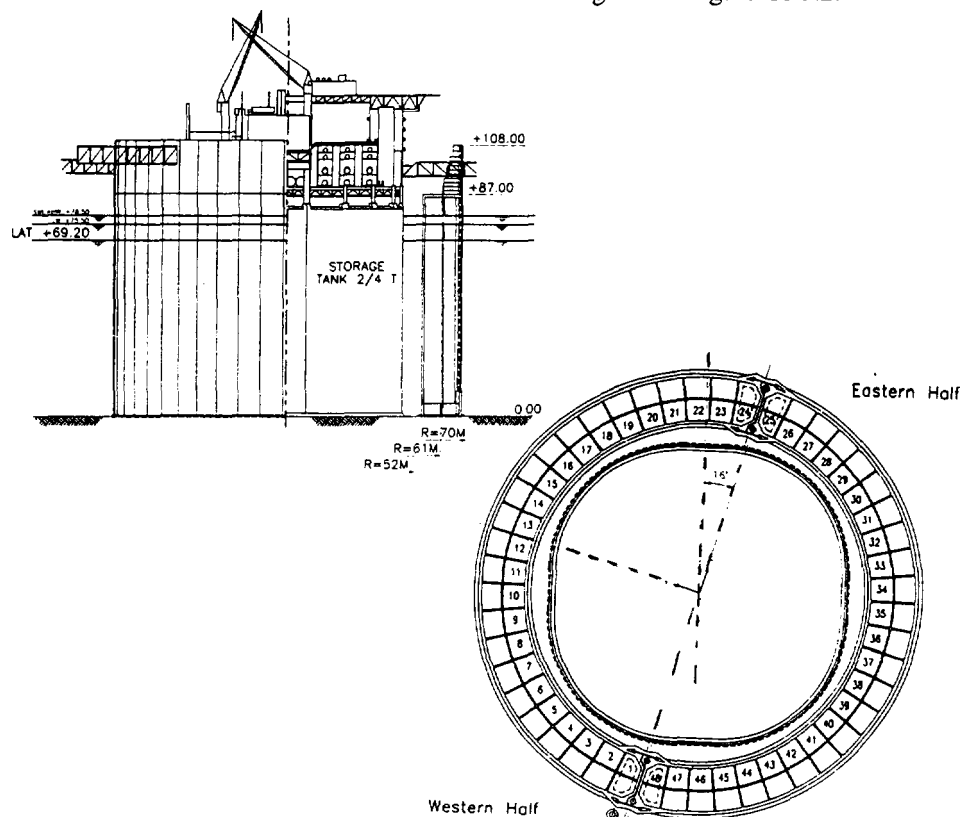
Side view and horizontal cross-section of the Ekofisk Protective Barrier
